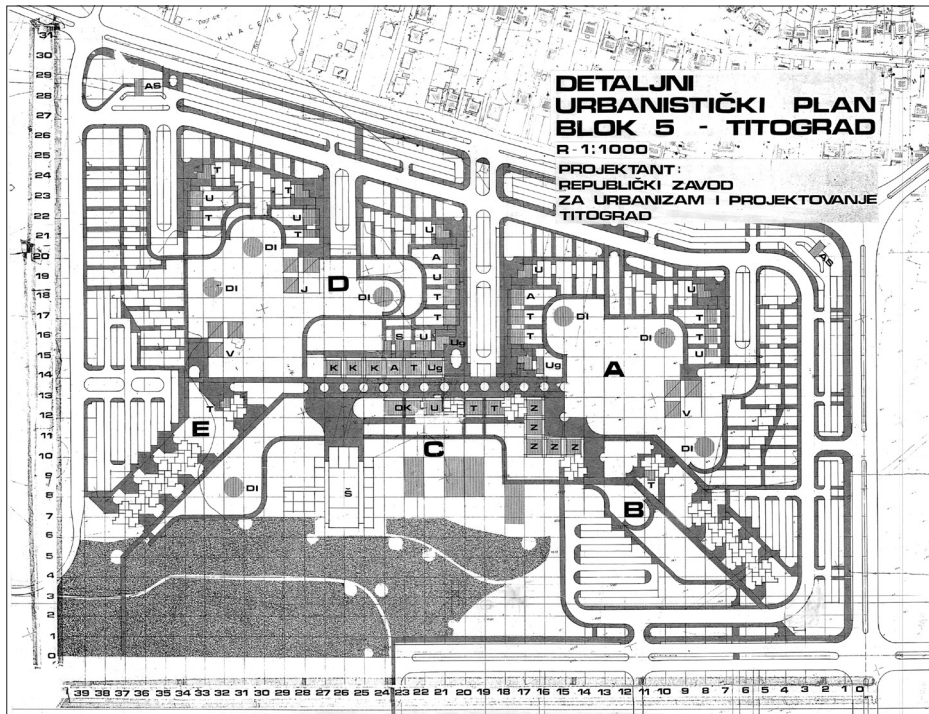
DETAILED URBAN PLAN OF BLOK 5, AUTHOR ARCHITECT VUKOTA TUPA VUKOTIĆ, 1976
